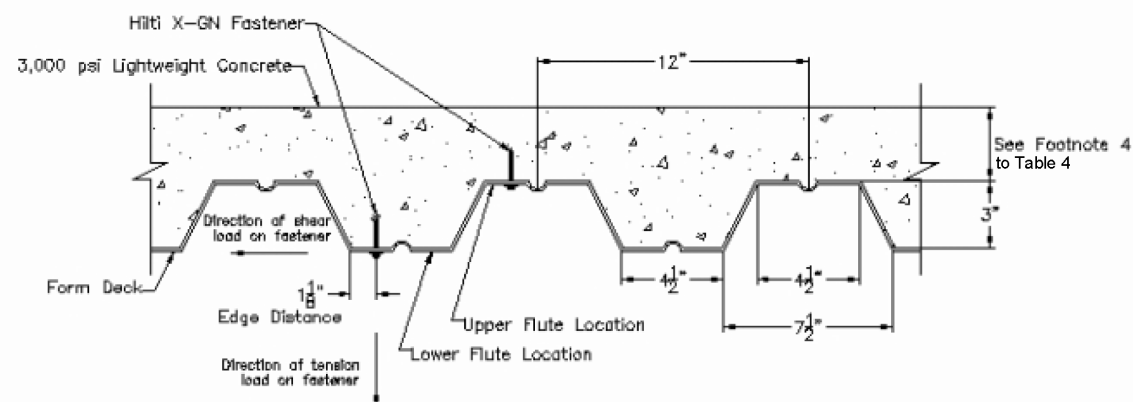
HILTI FASTENER INSTALLATION LOCATION IN 3-INCH-DEEP COMPOSITE FLOOR DECK
